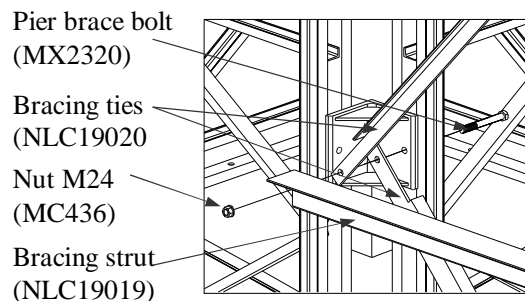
Tower bracing ties, tower bracing strut and angle bracket
